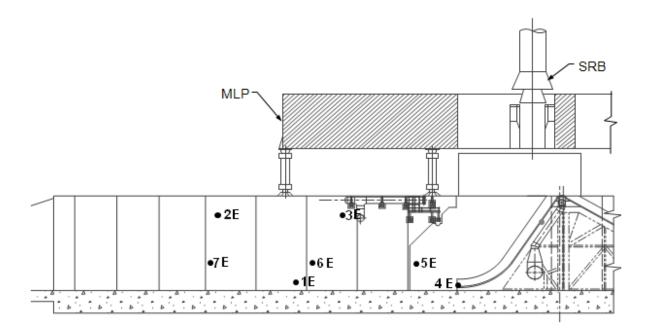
Sensor Locations on the East Wall of the SRB Flame Trench
